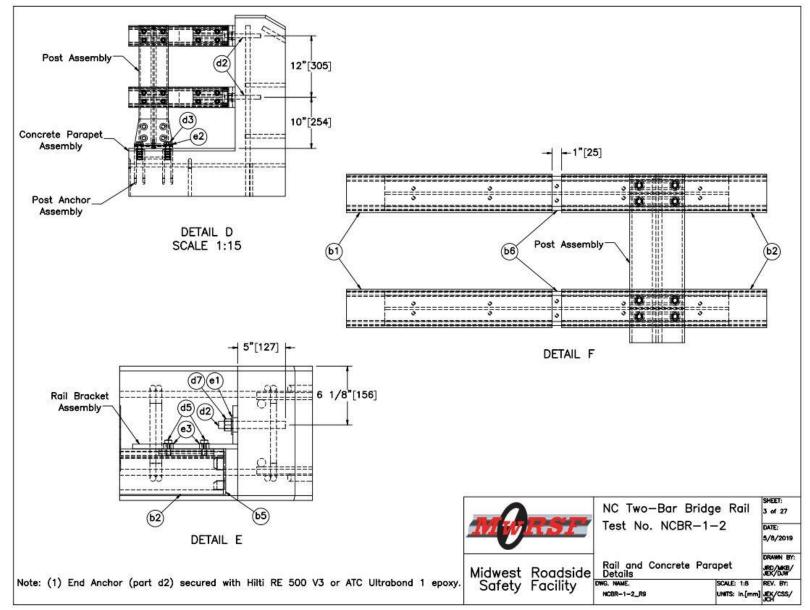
Rail and Concrete Parapet Details, Test Nos. NCBR-1 and NCBR-2
